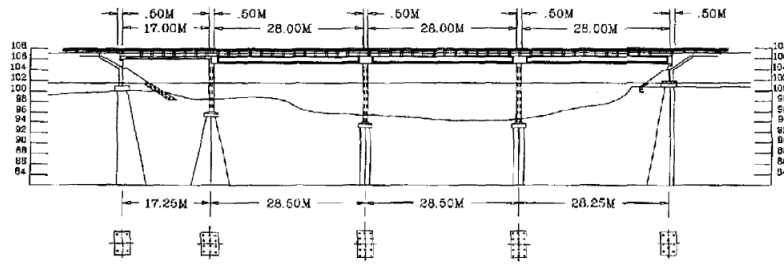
Rio Banano Bridge: Built drawing (after Priestly et al. [5])
